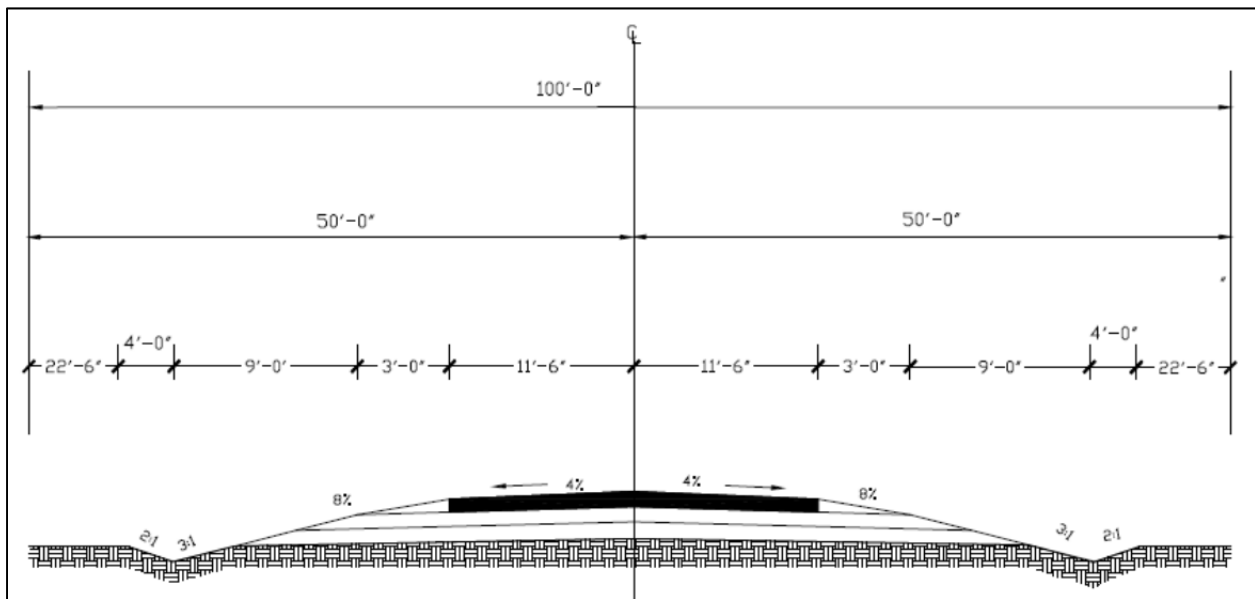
Typical cross section of 100 feet right-of-way¹⁵²
